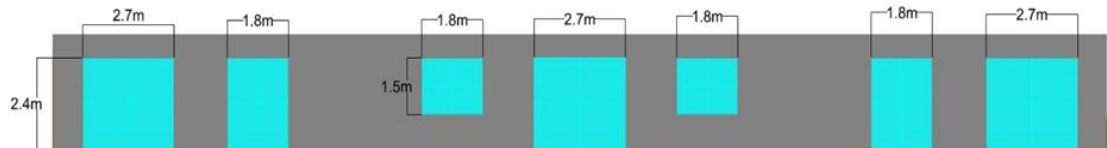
Window composition of the typical floor levels in the archetypal high-rise residential building
